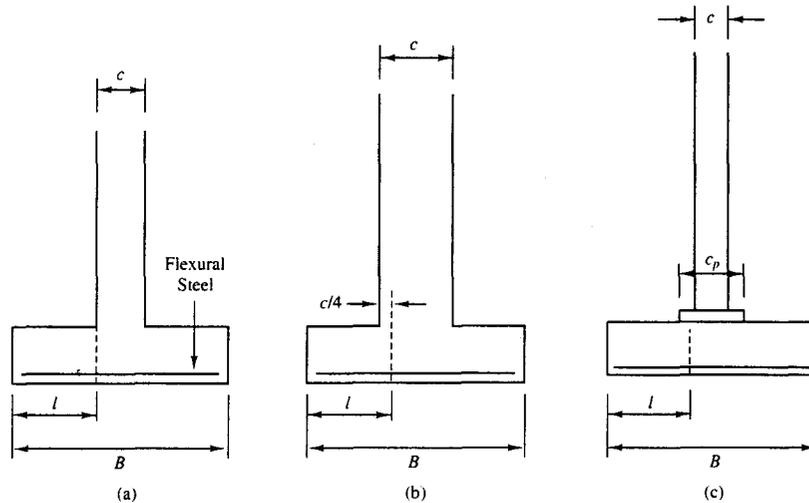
Location of critical section for bending: (a) with a concrete column; (b) with a masonry column; and (c) with a steel column.
